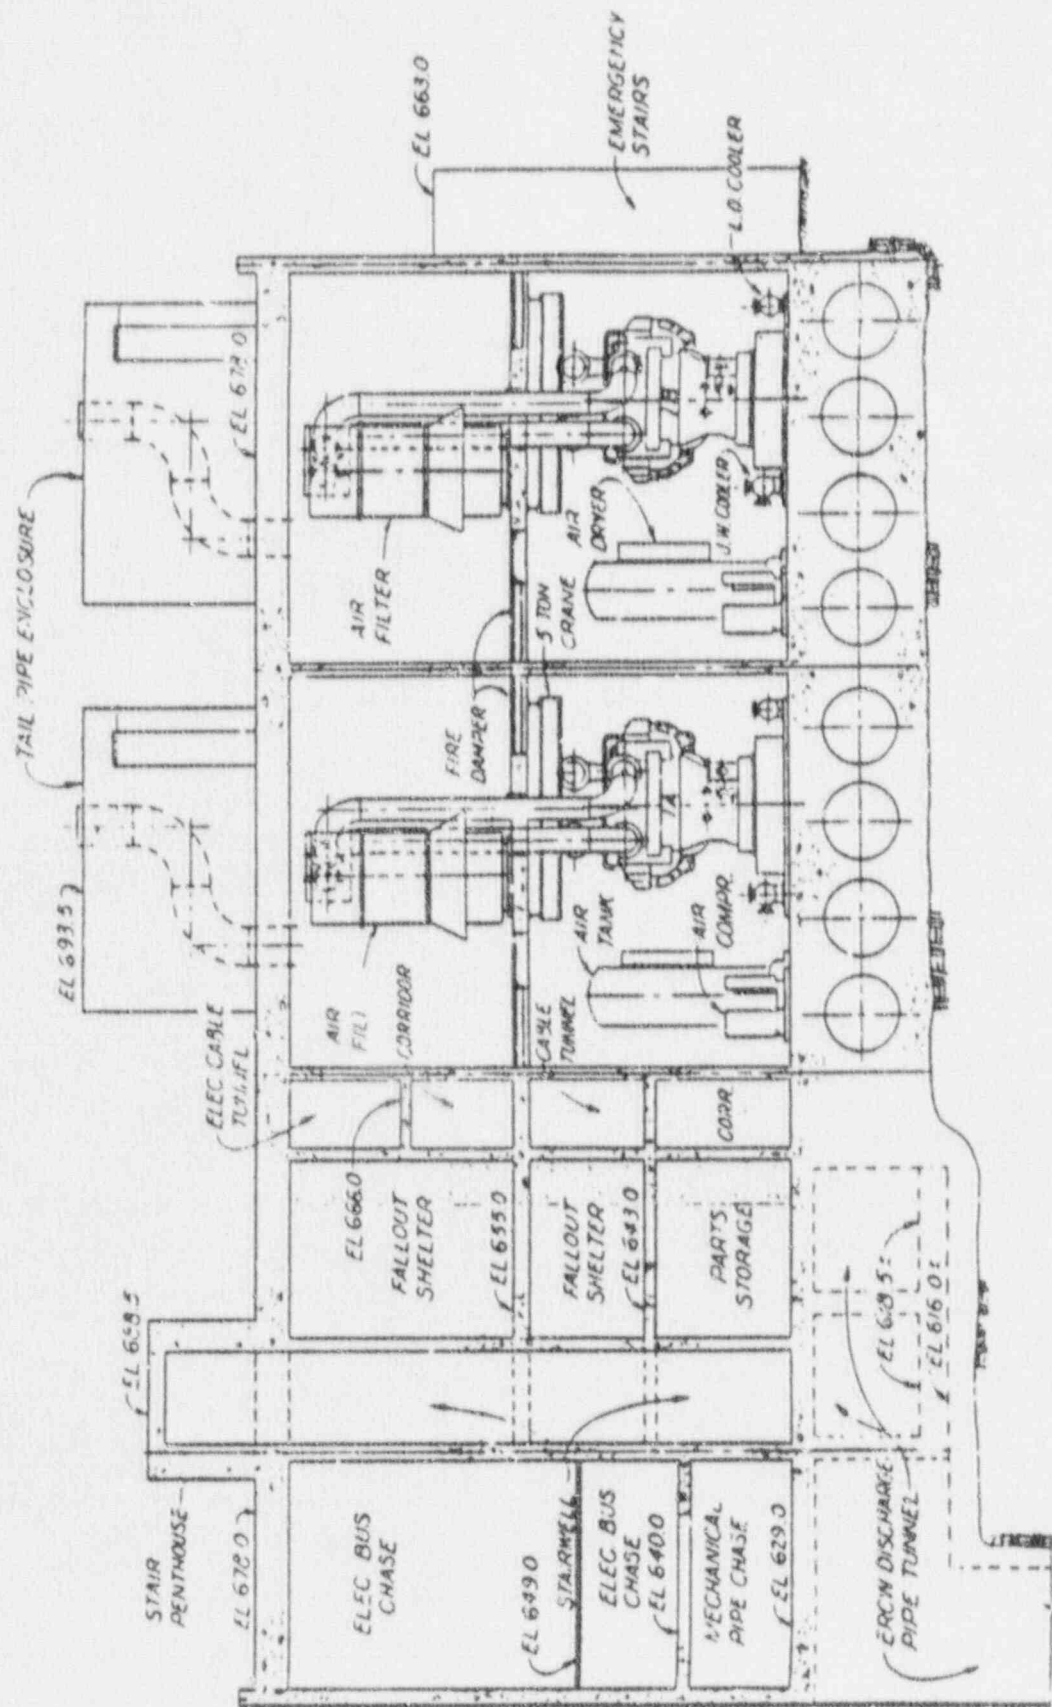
Elevation Views of the Bellefonte Diesel Generator Building (Sheet 2 of 2)
